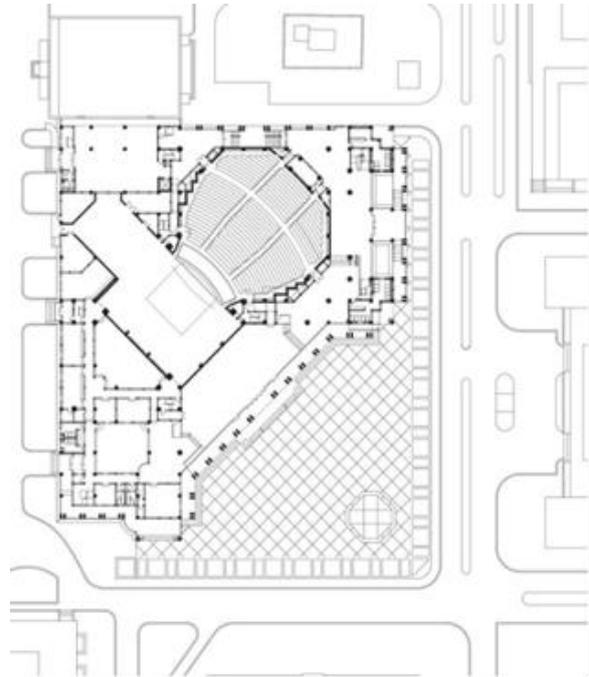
First floor plan of the Centennial Memorial Hall. Source: Qi Zhang Architectural Design Studio
